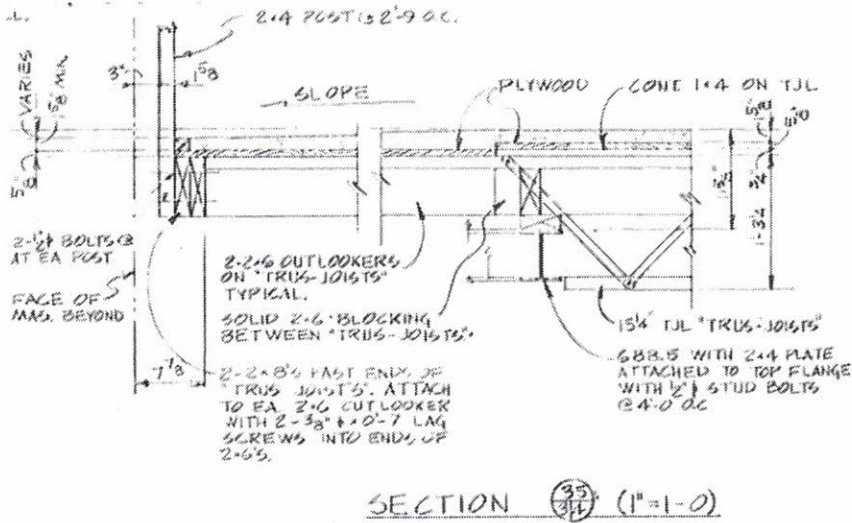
Section through 2nd-4th floor balconies (Structural Drawings).
